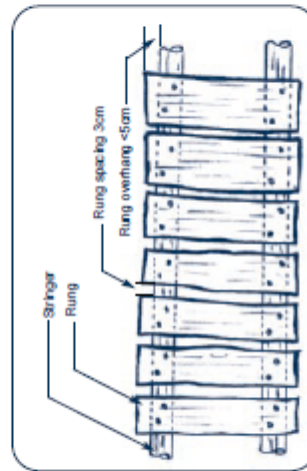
BRIDGE RUNG SPACING RUNG OVERHANG
